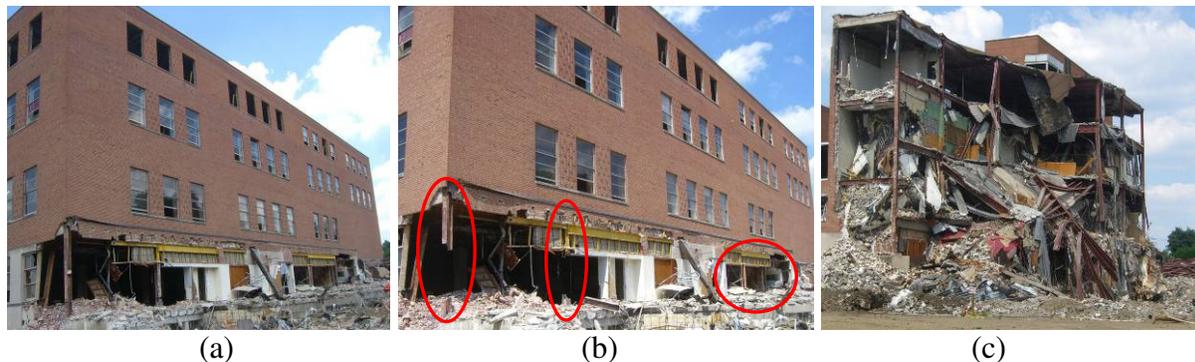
Before and After Removal of Four First-Story Columns of the Ohio Union Building
